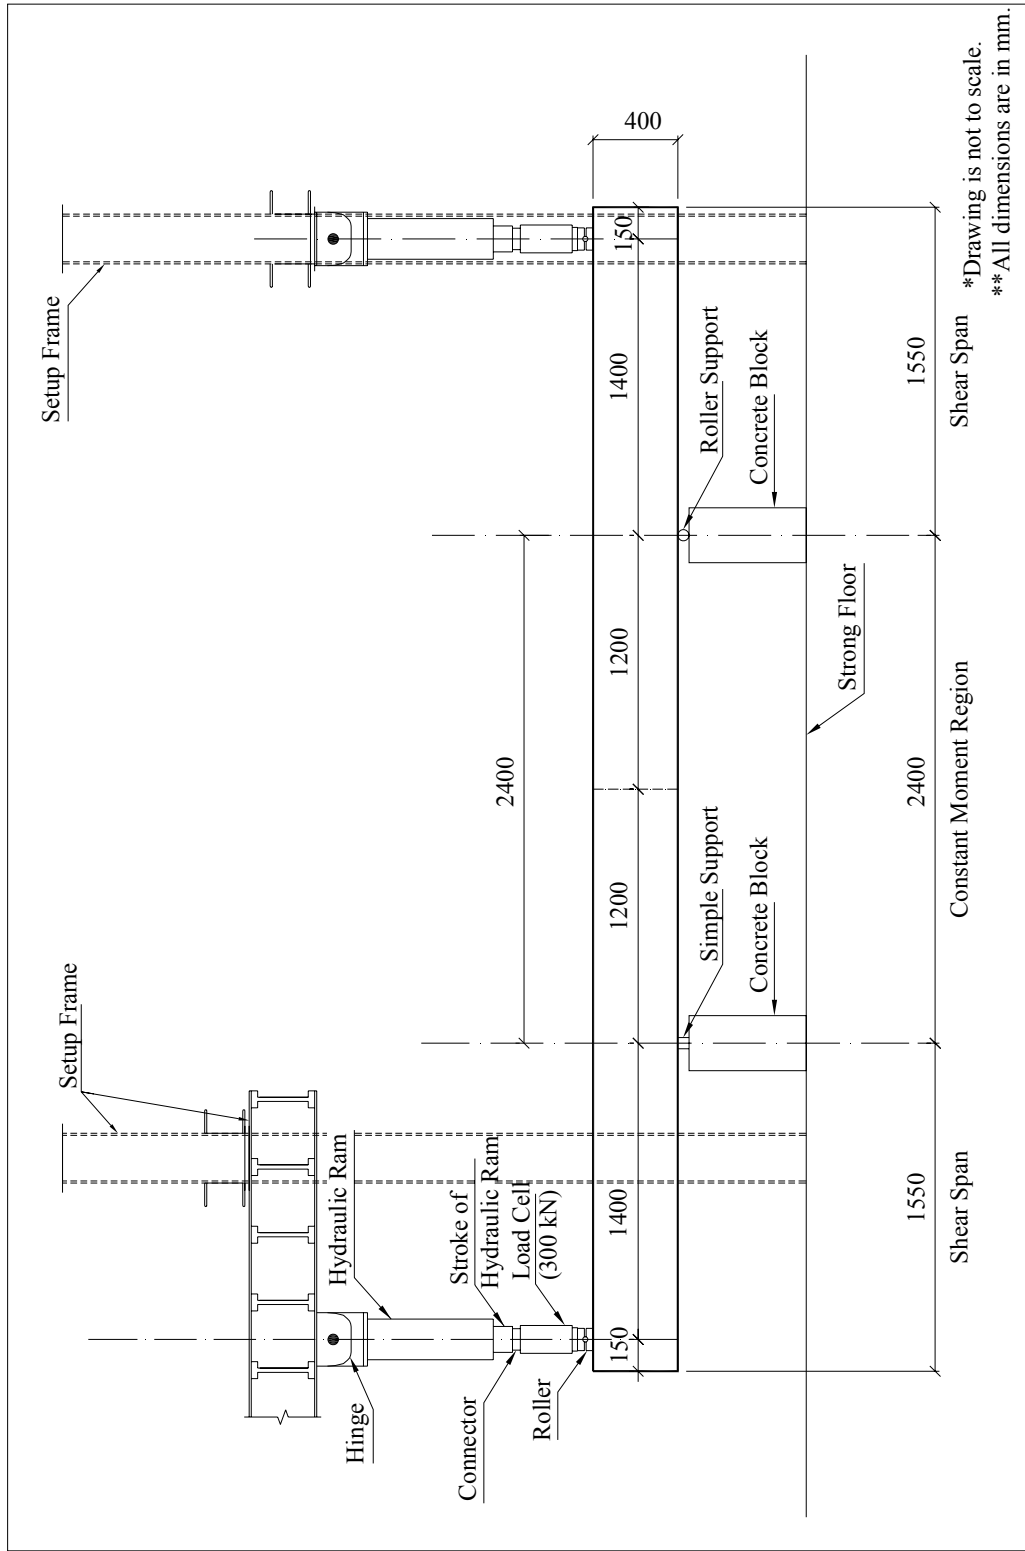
Test setup for Specimens TS-26, ACI-26 and ACI22
